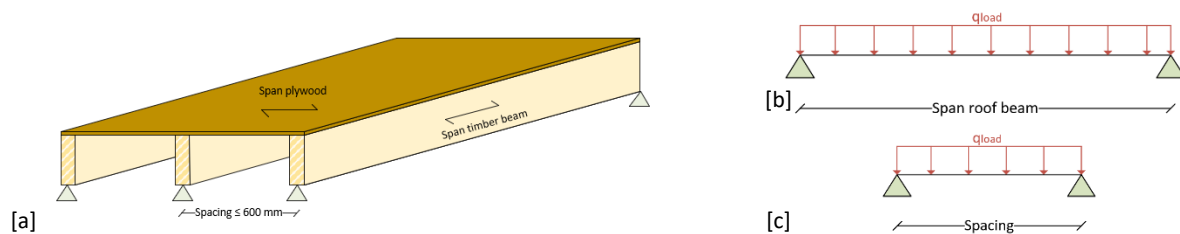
Roof structure. [a] 3D Structure; [b] Structural scheme beam; [c] Structural scheme plywood (Self-produced).
